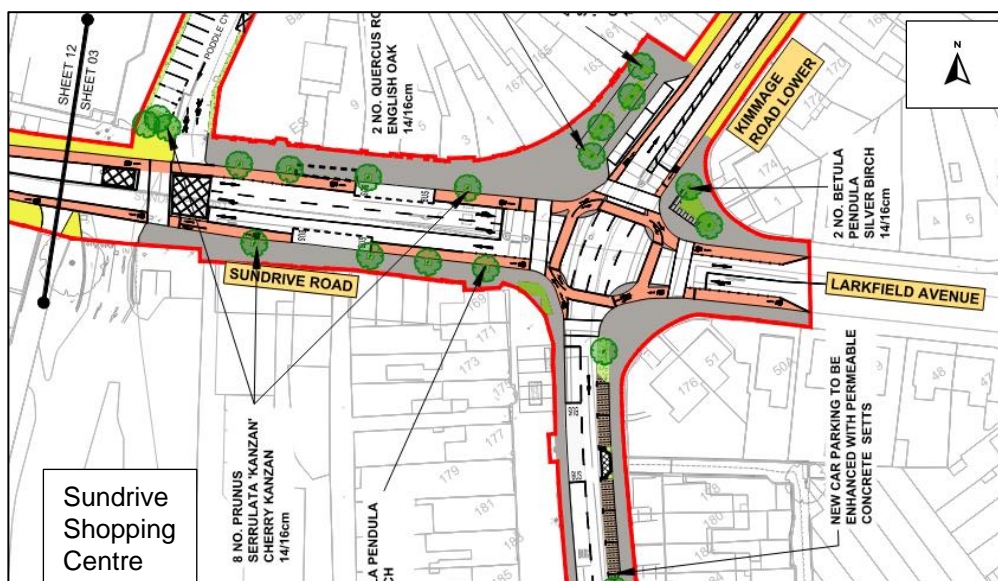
Proposed Public Realm Improvement at Kimmage Village (Sundrive Cross)
